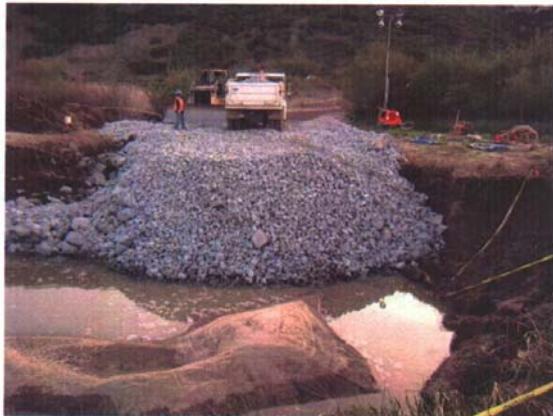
The repair area and temporary access construction as of Thursday evening. Much of the rock will be used to create a stable platform for the new pipe segment, and the remainder will be removed before site restoration.
